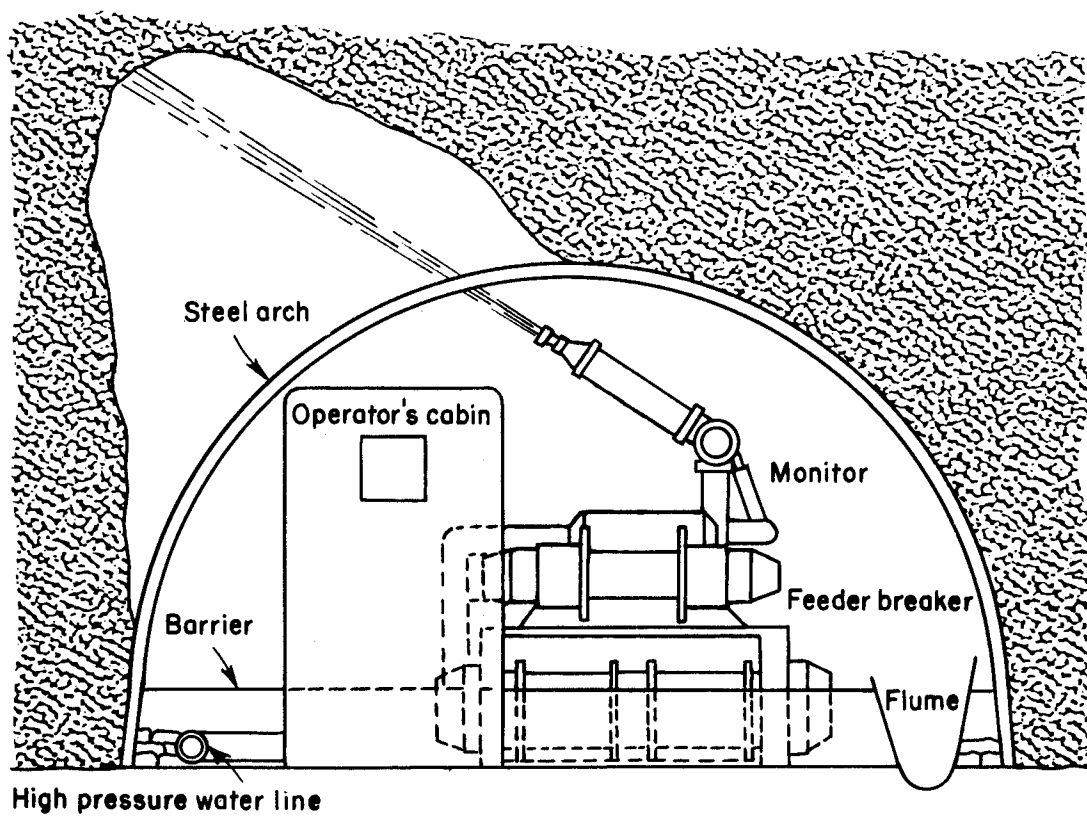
END VIEW OF RETREATING FACE AREA, HYDRAULIC MINE
